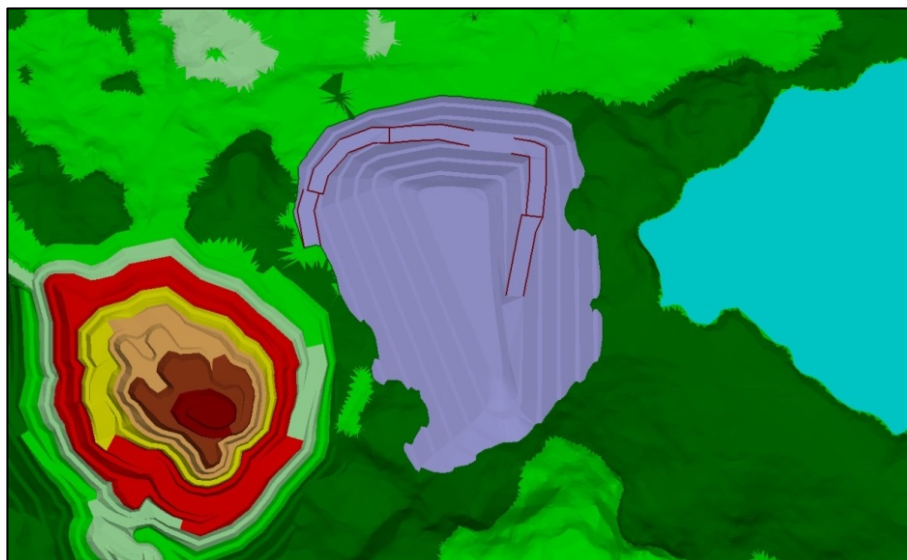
BYG-Krian: - Infrastructure Layout (3D)
